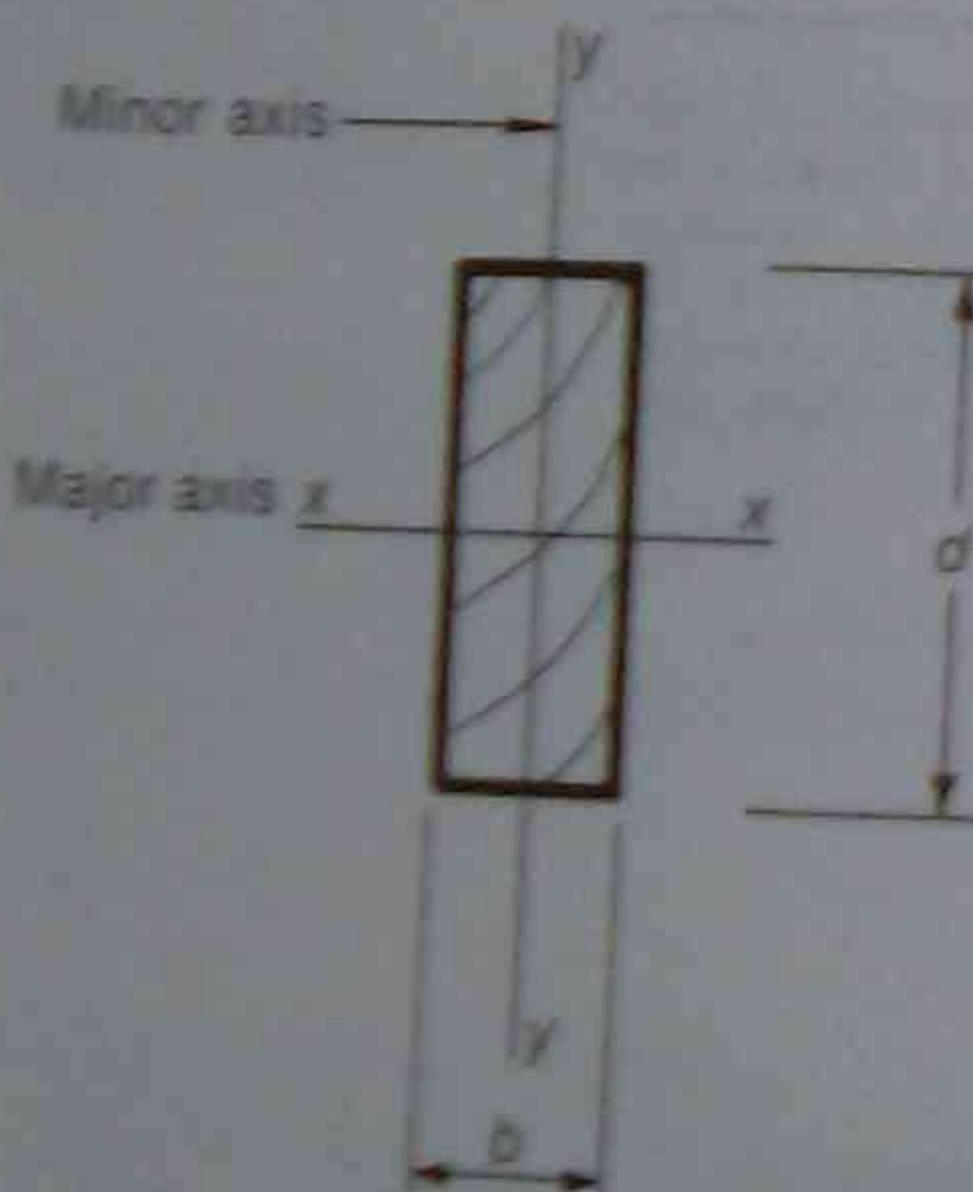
NOTATION FOR A RECTANGULAR CROSS-SECTION
